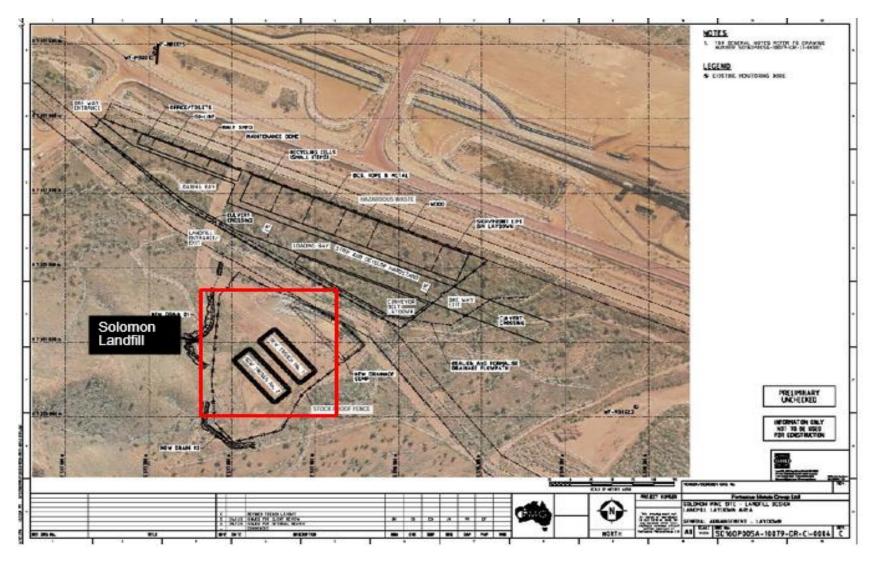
The used tyre and other waste rubber disposal sites as per Condition 7, Table 4. Firetail North Waste Dump and Firetail Waste Wood Disposal Area are for the disposal of untreated timber.
